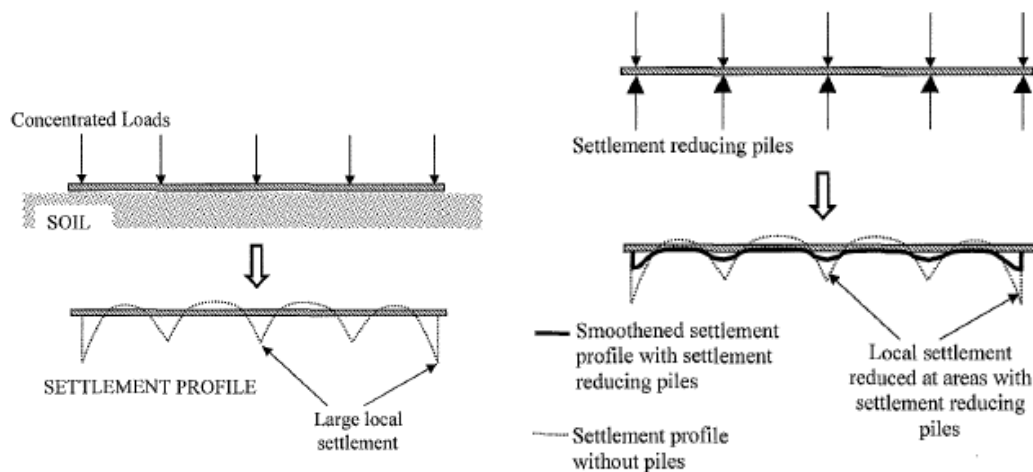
Settlement reducing piles to control local deformations (Chow and Tan, 2004)
